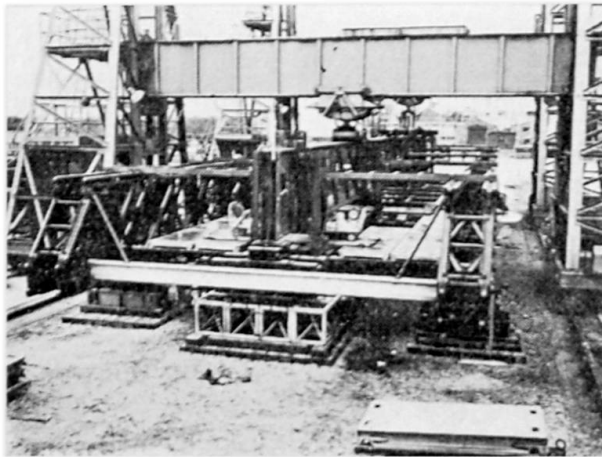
2nd Full Scale Test. View of test rig and test girder.
